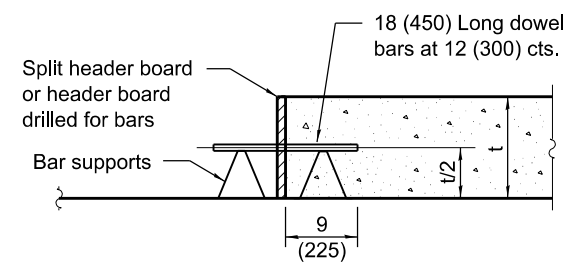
DETAIL OF ADDED REINFORCEMENT FOR PAVEMENT BLOCK-OUTS
